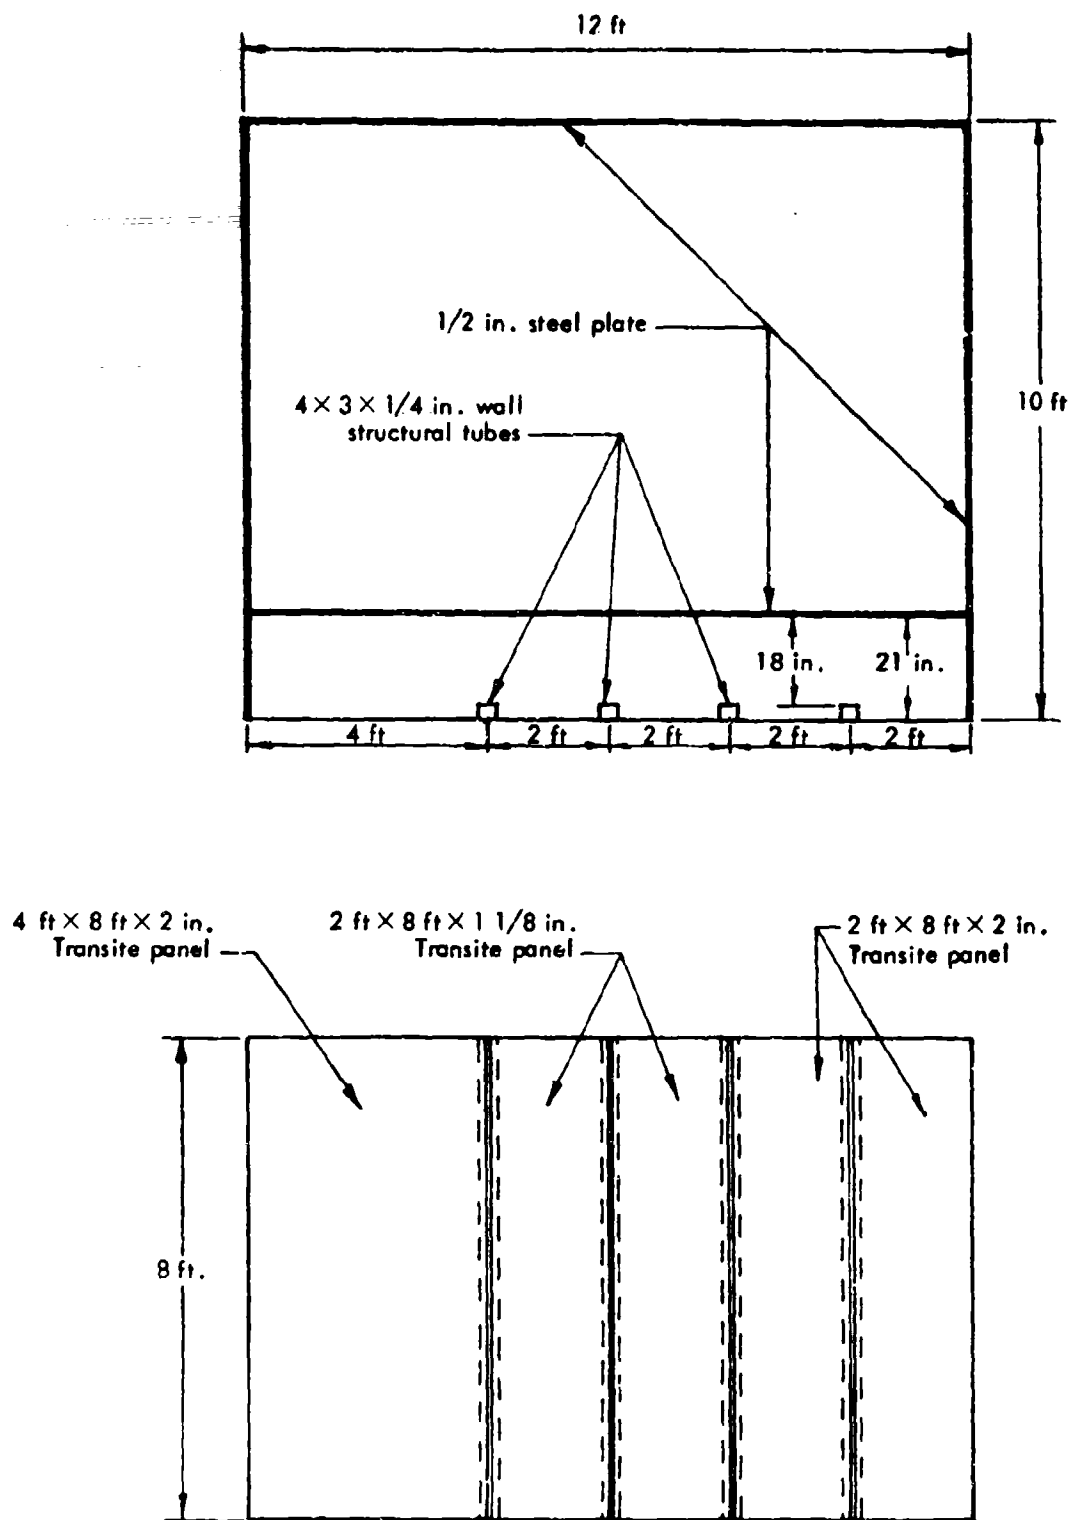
Design for steel test structure. (a) Plan view; (b) front elevation.
